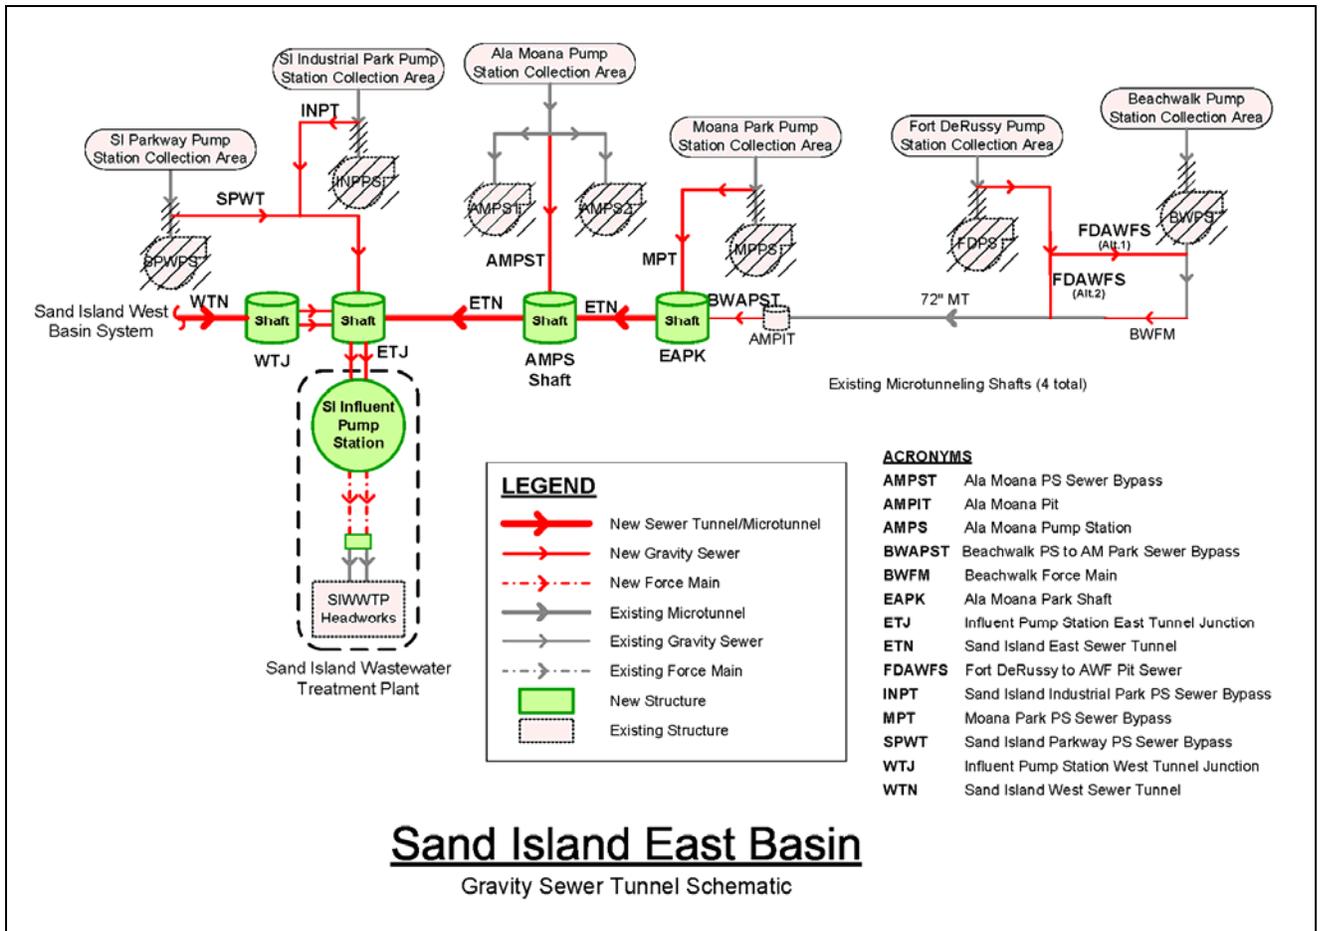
Sand Island East Basin Gravity Sewer Tunnel Schematic
